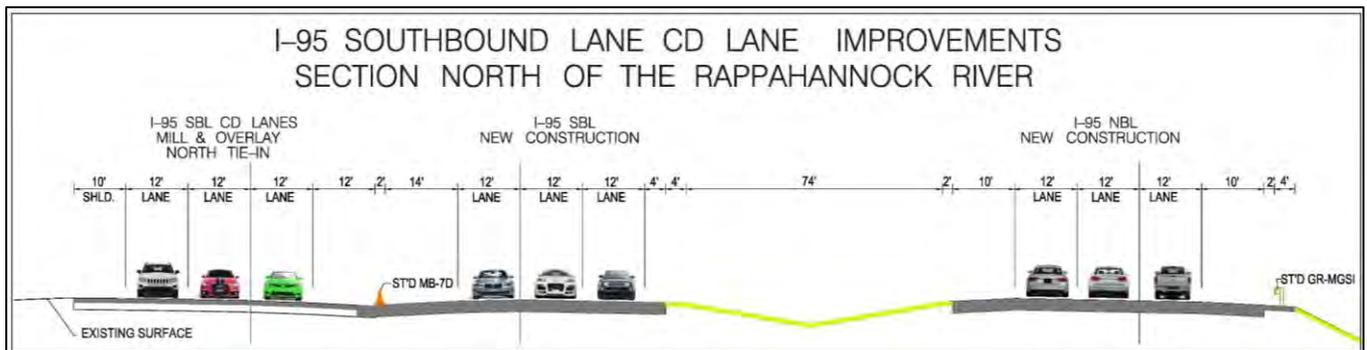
Proposed Typical Section north of the Rappahannock River
